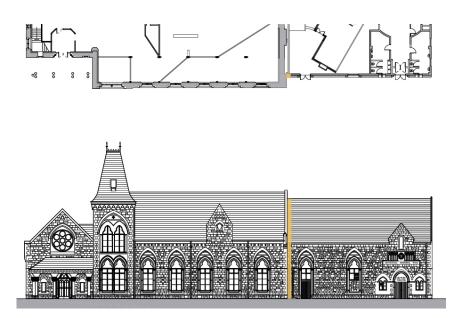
Existing Rolleston Avenue Museum Plan & Elevation. Area in orange indicates the extent of 1958 façade & roof fabric removal for the separation in context with the whole Rolleston Avenue façade.
